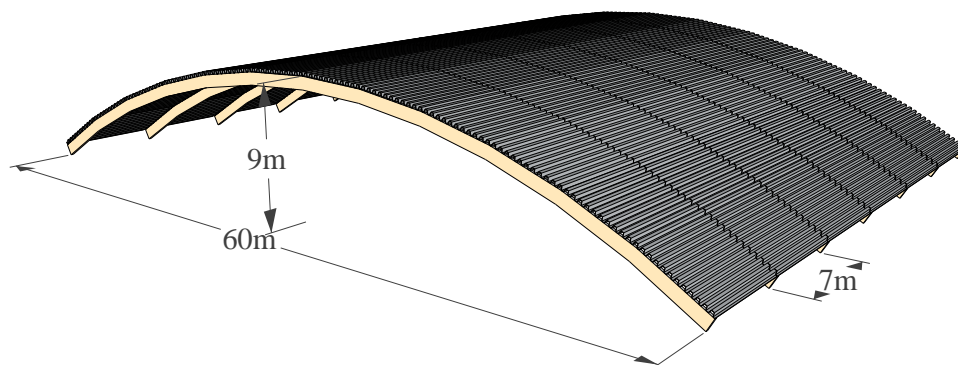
Large span arch building with trapezoidal roof sheathing.
